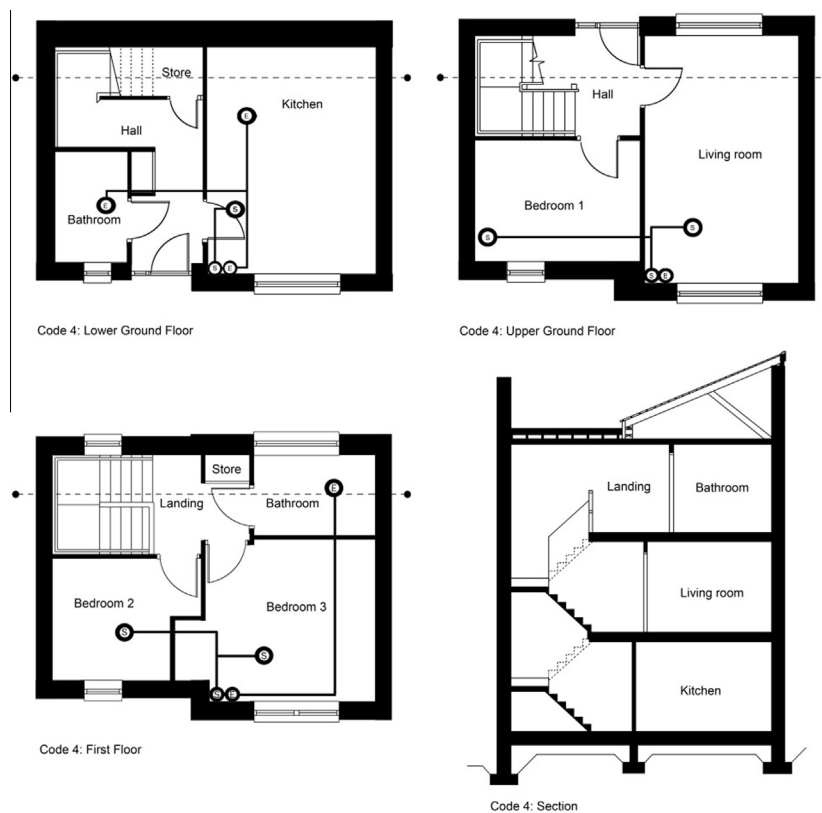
Plans, sections and MVHR layout of Code 4 dwellings.
